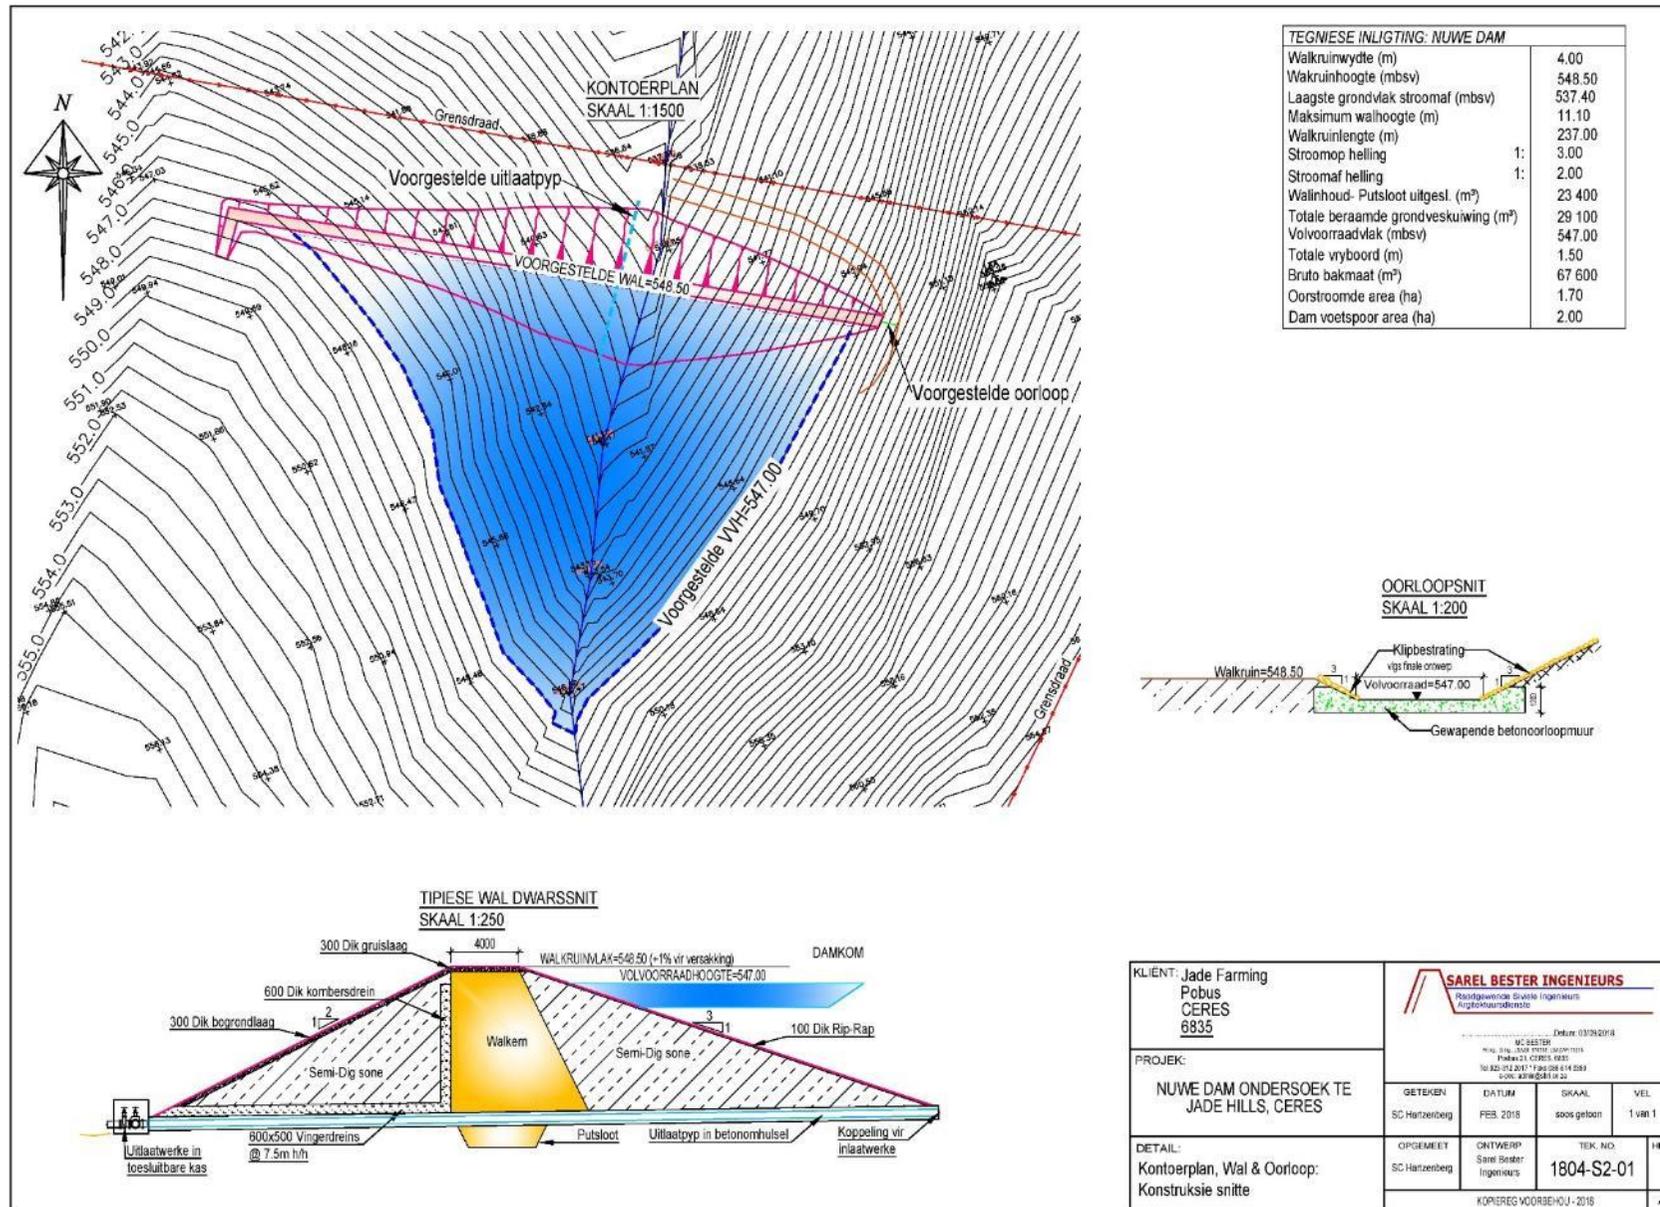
Proposed design drawing of the Jade Hill dam and associated dam wall (Sarel Besters Ingenieurs, 2018).
